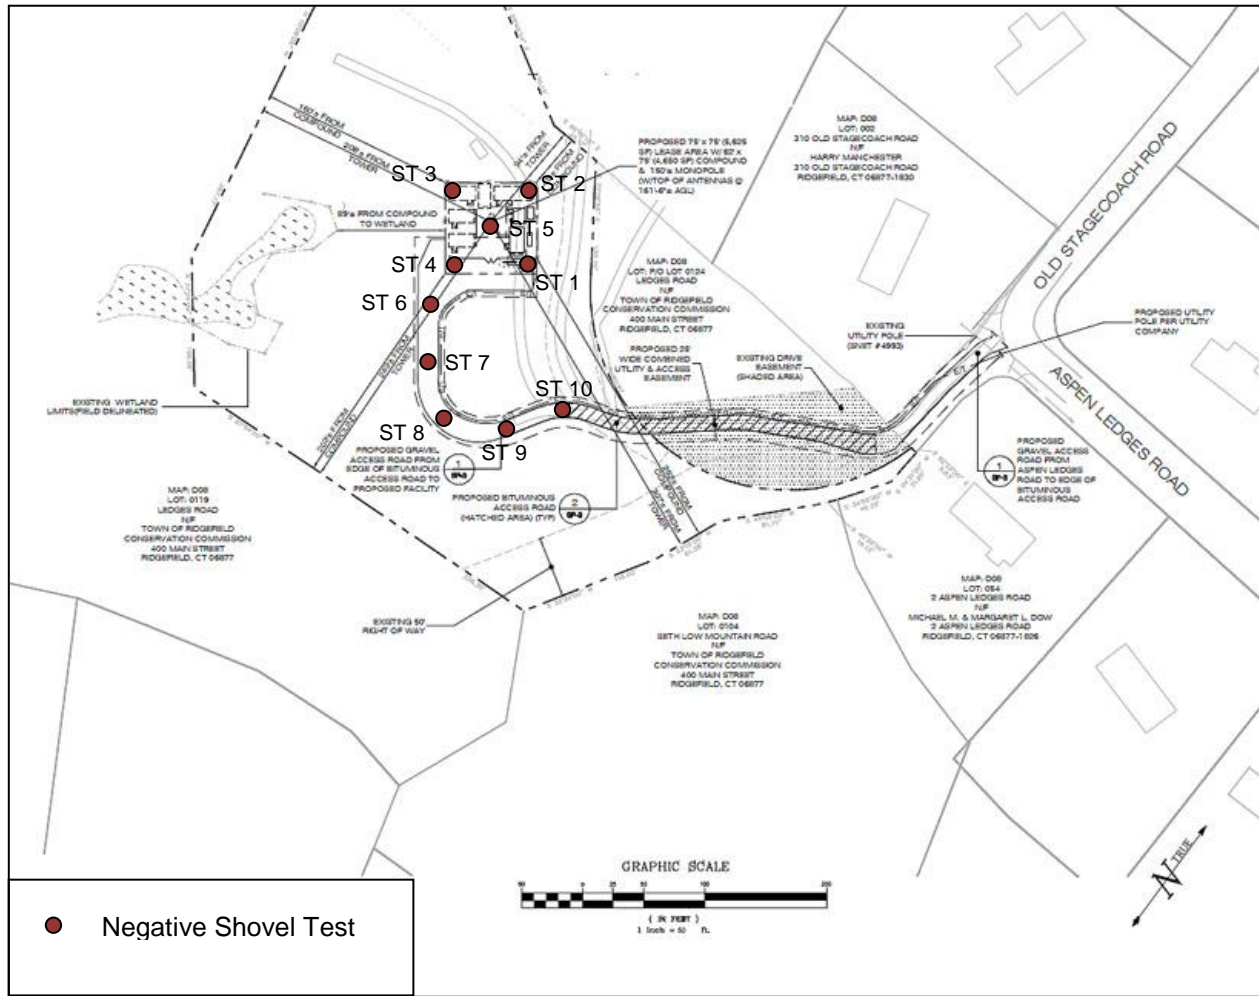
Plan view of the proposed project area depicting the tower and access road locations, as well as excavated shovel tests, in Ridgefield, Connecticut.
